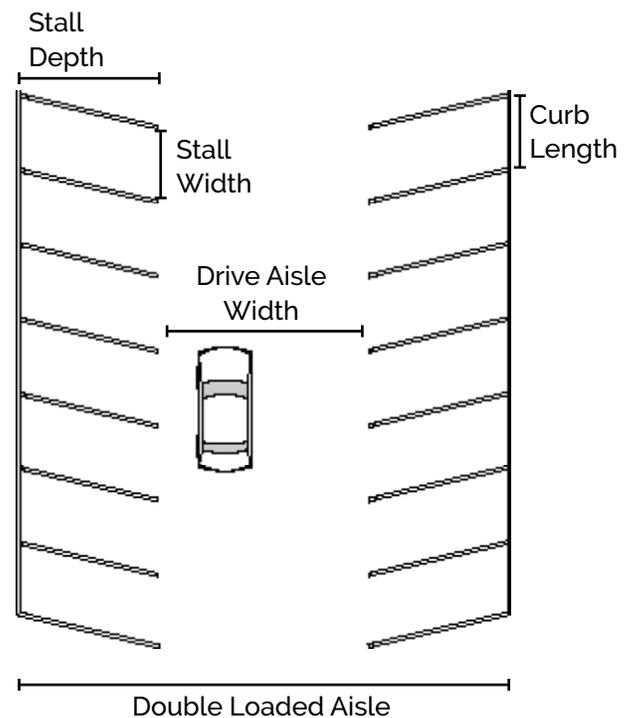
Parking Space and Drive Aisle Dimensions.
